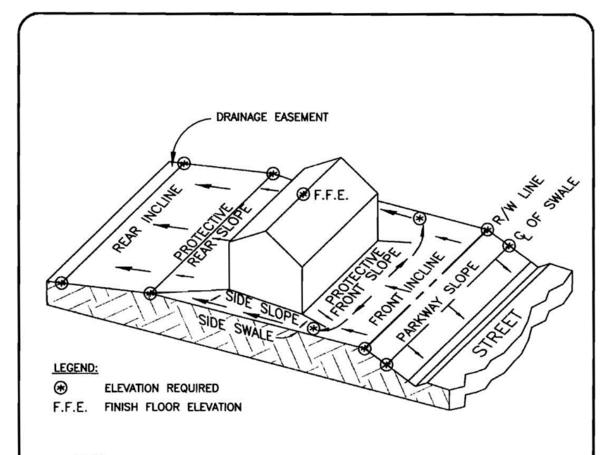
B TYPE B TYPICAL GRADING PLAN
